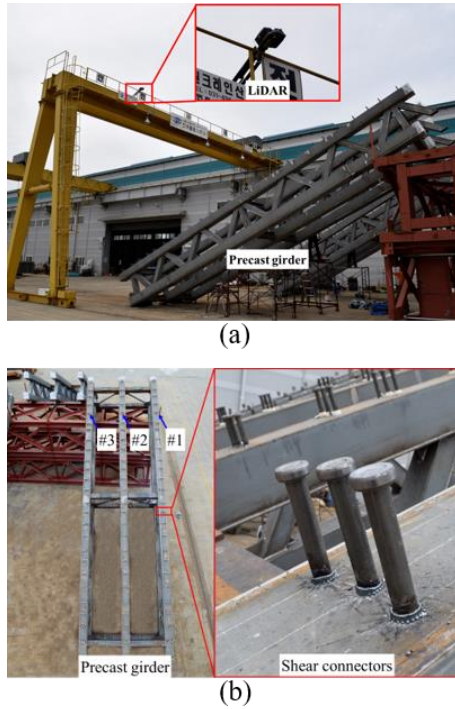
Test configuration of the full-scale girder scanning. (a) Test set-up, (b) A full-scale precast girder.
